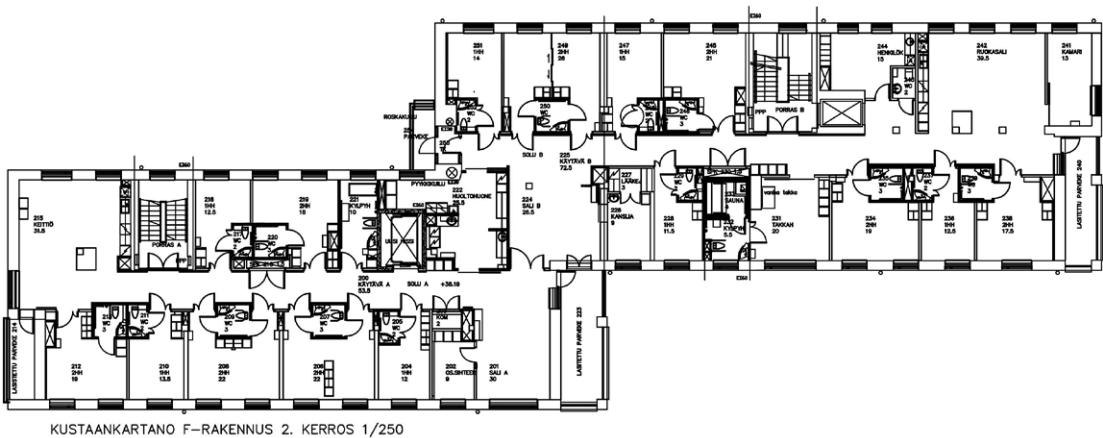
Kustaankartano sheltered housing has little shared spaces, and the private rooms are from 10 m² to 15 m². (Original design by architects E. and O. Saijonmaa, renovation by Architects Brunow and Maunula).
